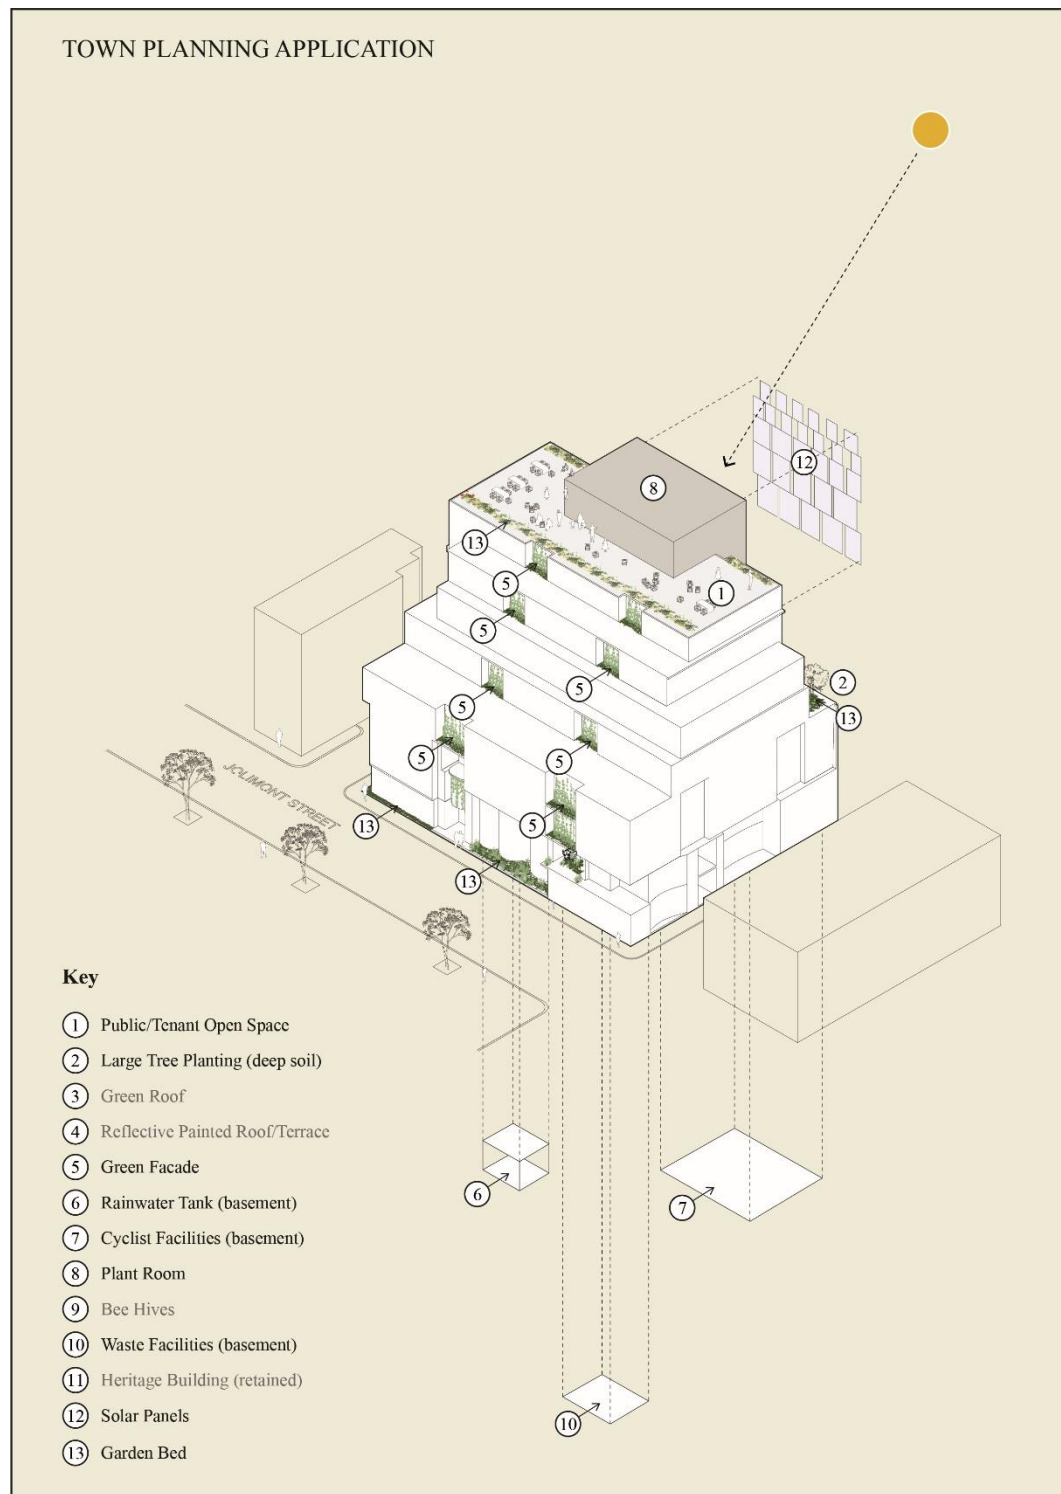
shows the Jolimont Street development as the current town planning application articulates, highlighting green infrastructure and sustainability elements. The diagram shows some deep soil planting, with green façade treatment and usable green rooftop space as well as application of solar panels.
